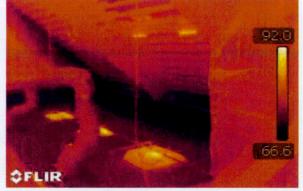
Thermographic image from inside the attic shows cold air infiltration at the wall to roof transition.
